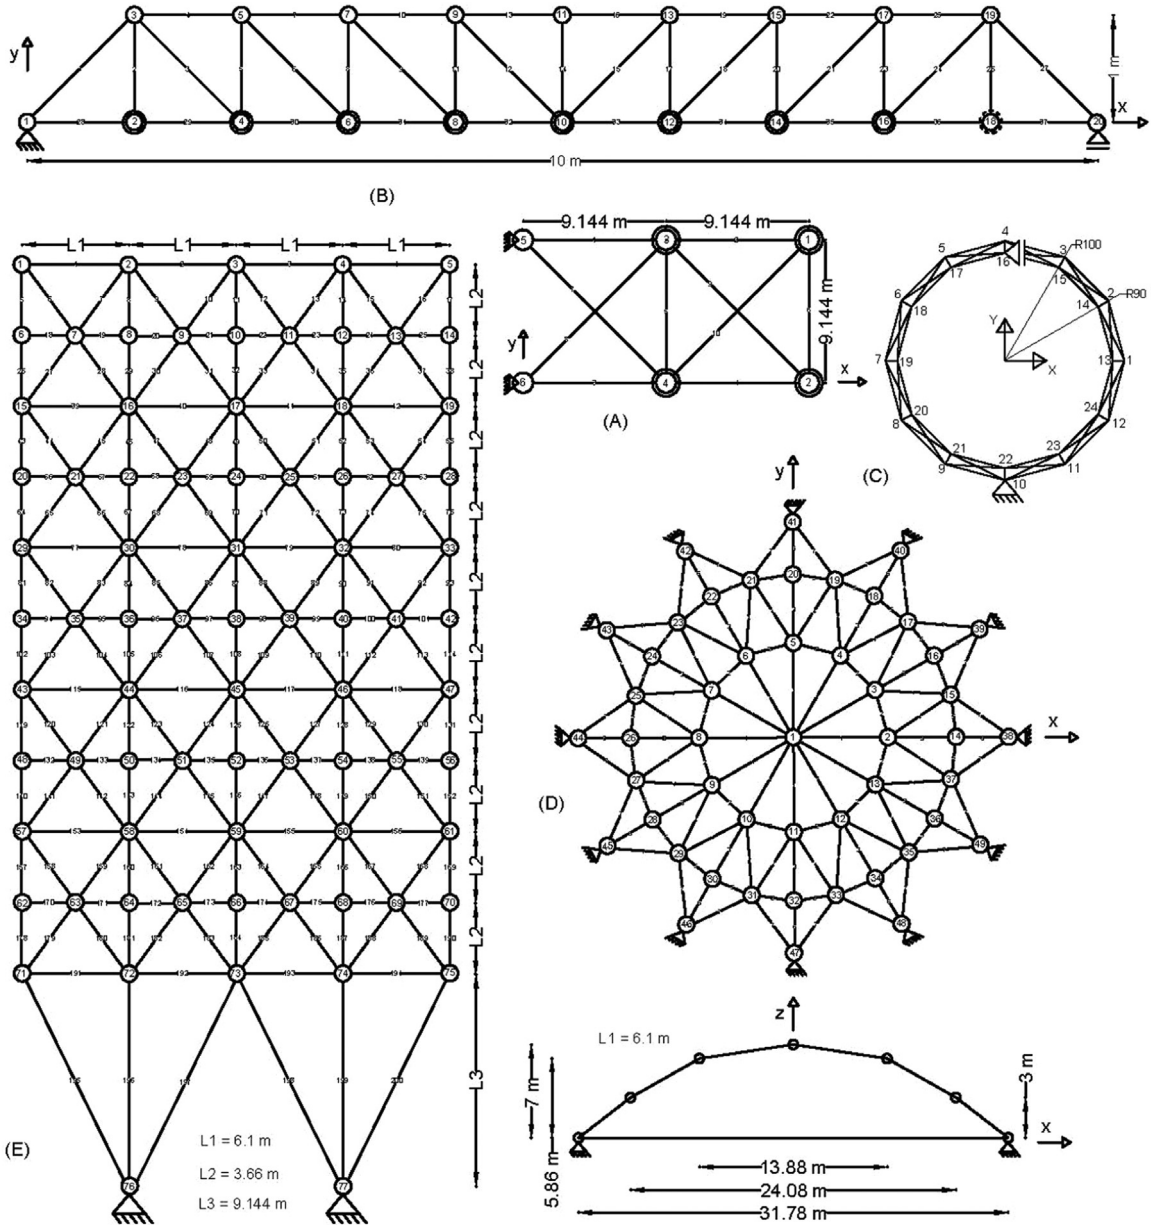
Trusses: (A) 10-bar truss, (B) 37-bar truss, (C) 60-bar truss, (D) 120-bar truss, and (E) 200-bar truss.
